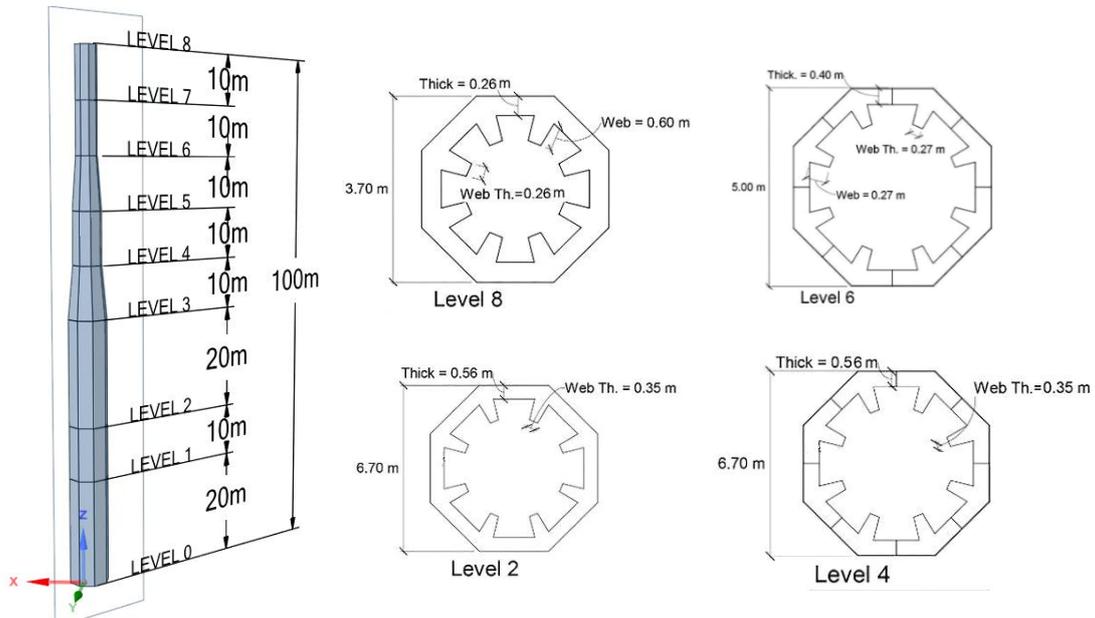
Cross-section details for octagonal pre-stressed concrete (case study)
